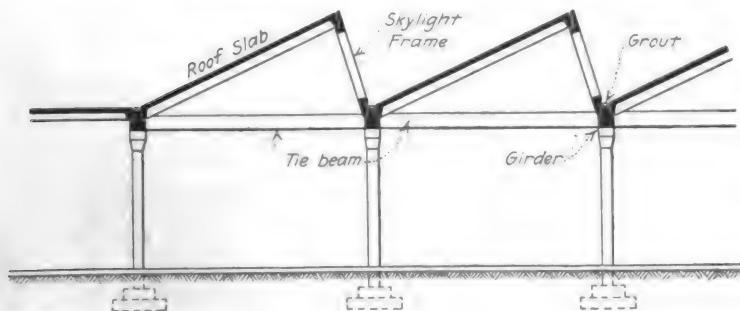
Cross-section showing typical arrangement of units in saw-tooth construction, "Unit System."
